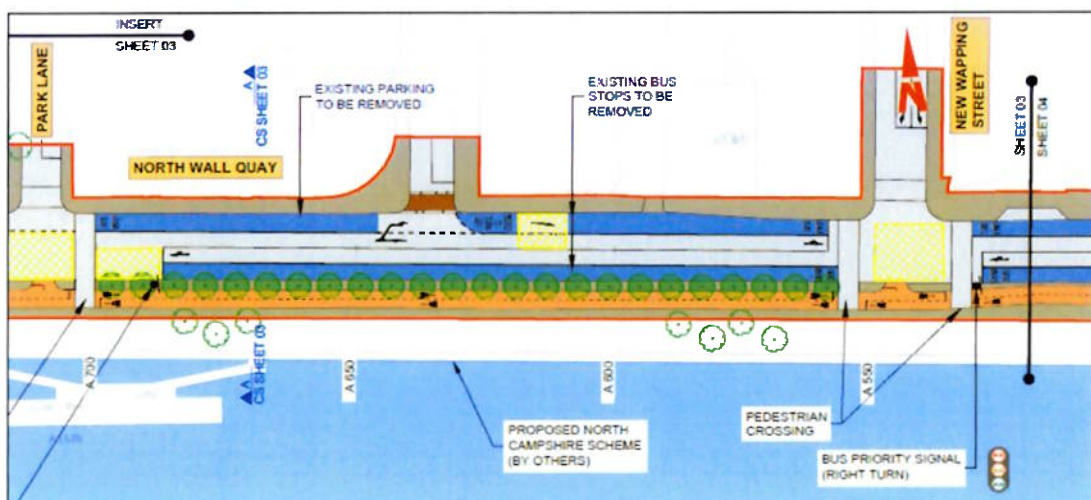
Extract from General Arrangement Drawing Sheet 3 Part 2 North
